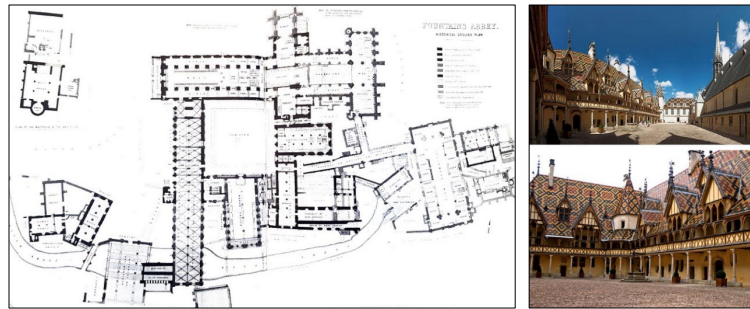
Ground plan of Fountains Abbey, Yorkshire, England, showing the infirmary hall as later subdivided into rooms (Thompson & Goldin 1975, p. 43)
